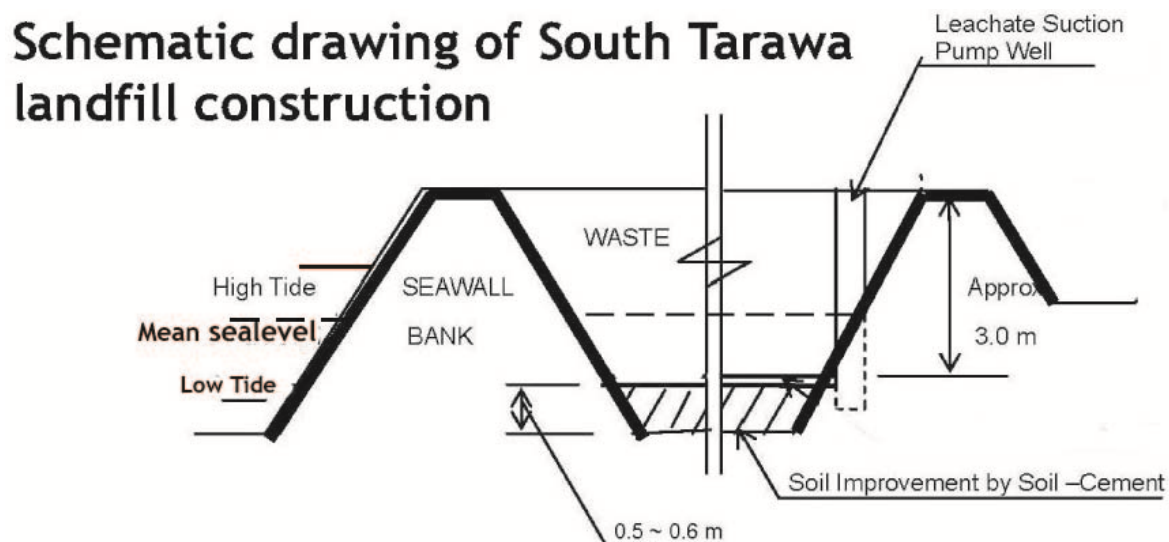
Cross-sectional drawing of Bikenibeu landfill construction.
